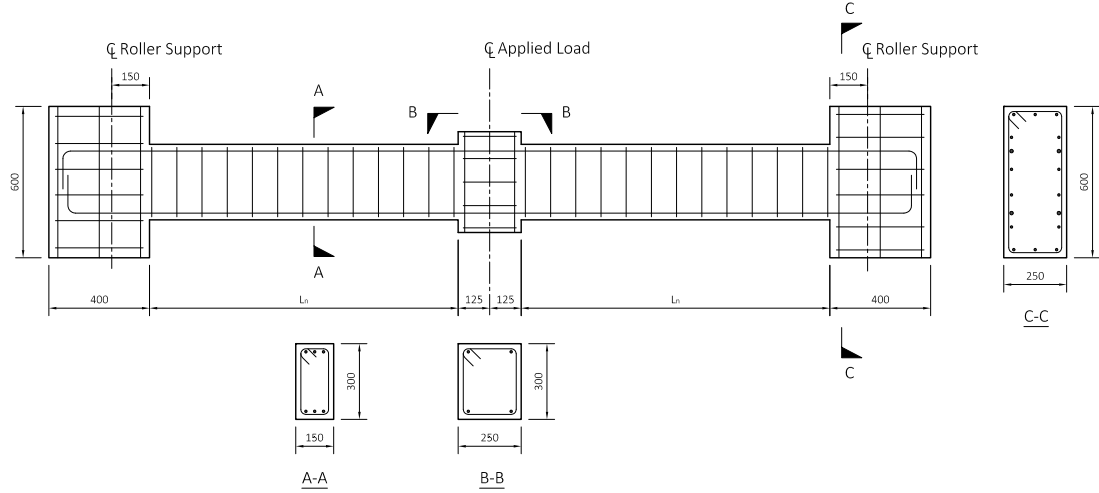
Geometric and reinforcement layout of specimens, adapted from Su (2009).
